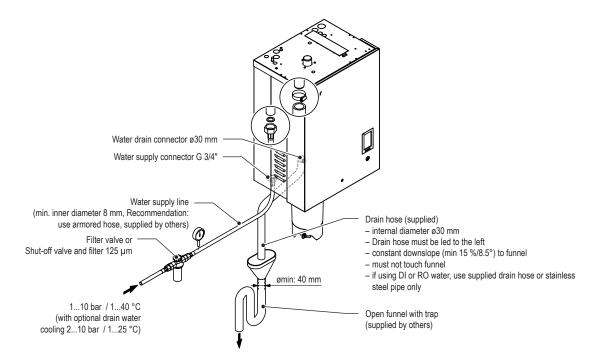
Overview water installation for single units Small ("S") and Medium ("M")
